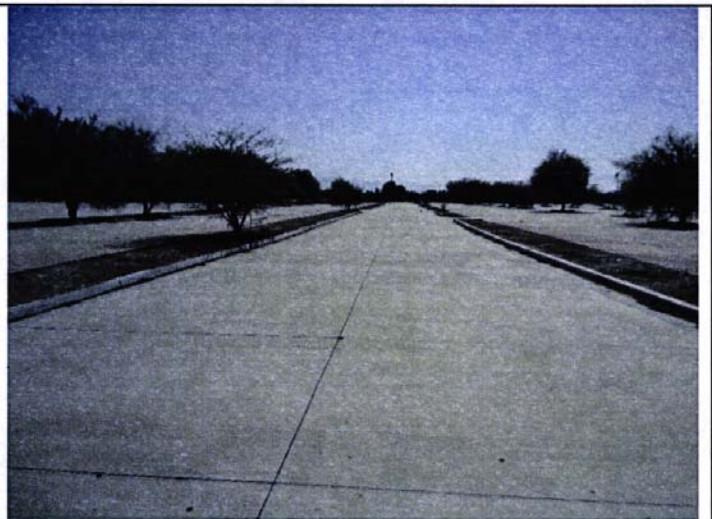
Paved property southeast of Ramon Rd. & Crossley Rd.
